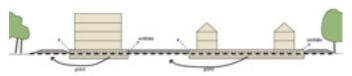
Parking garages under buildigs, half-deepened, creating more green open space, the excavated soil is used for raising the ground level to better fit in the landscape; source: Wurck
